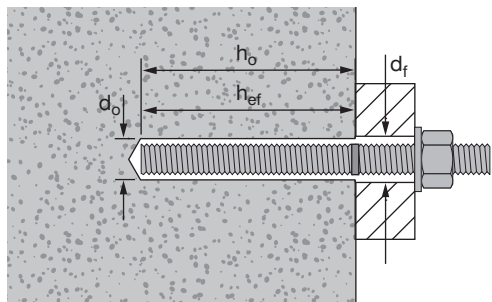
Hilti HIT-HY 270 specifications for HIS-N and HIS-RN inserts in grout-filled concrete masonry walls
